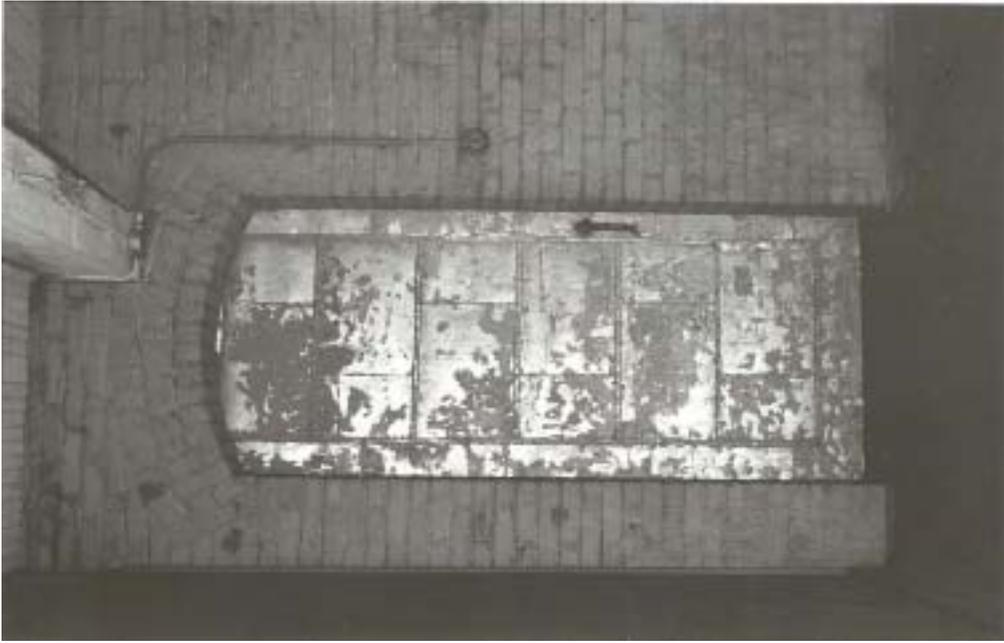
Room 208, north wall: fire door in doorway D- 28, leading to Room 203 (hall) [1993].
